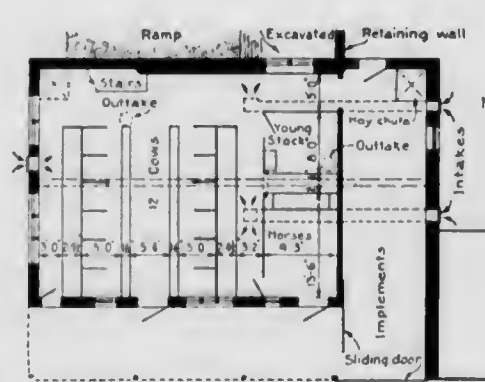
Suggested rearrangement of plan shown in Figure 14.
